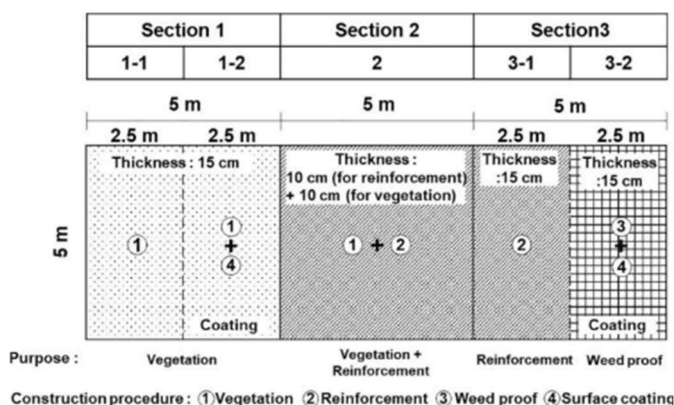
Construction plan of BPST implementation for slope surface protection
